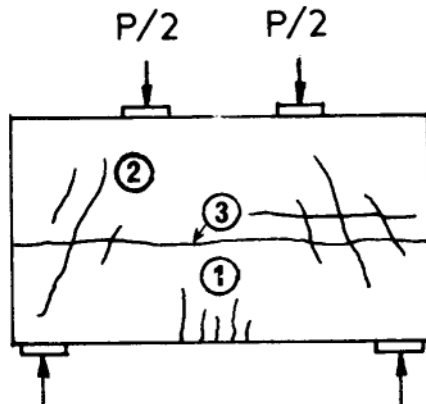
Typical sequence in which the cracks appeared in top-loaded slender deep beams
